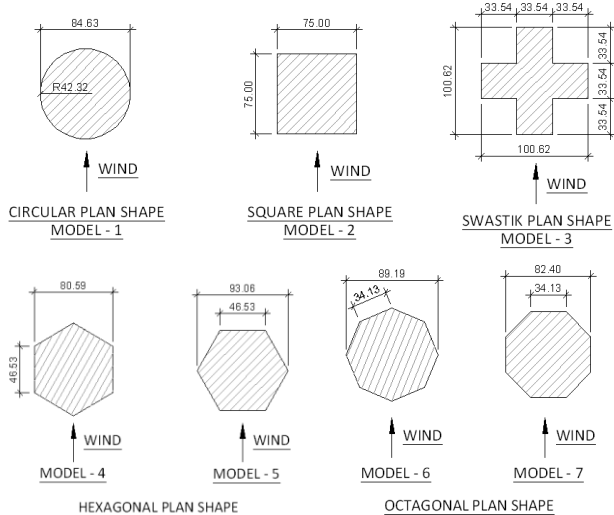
Tall Building Geometry with Different Plan Shapes with Same Plan Area
